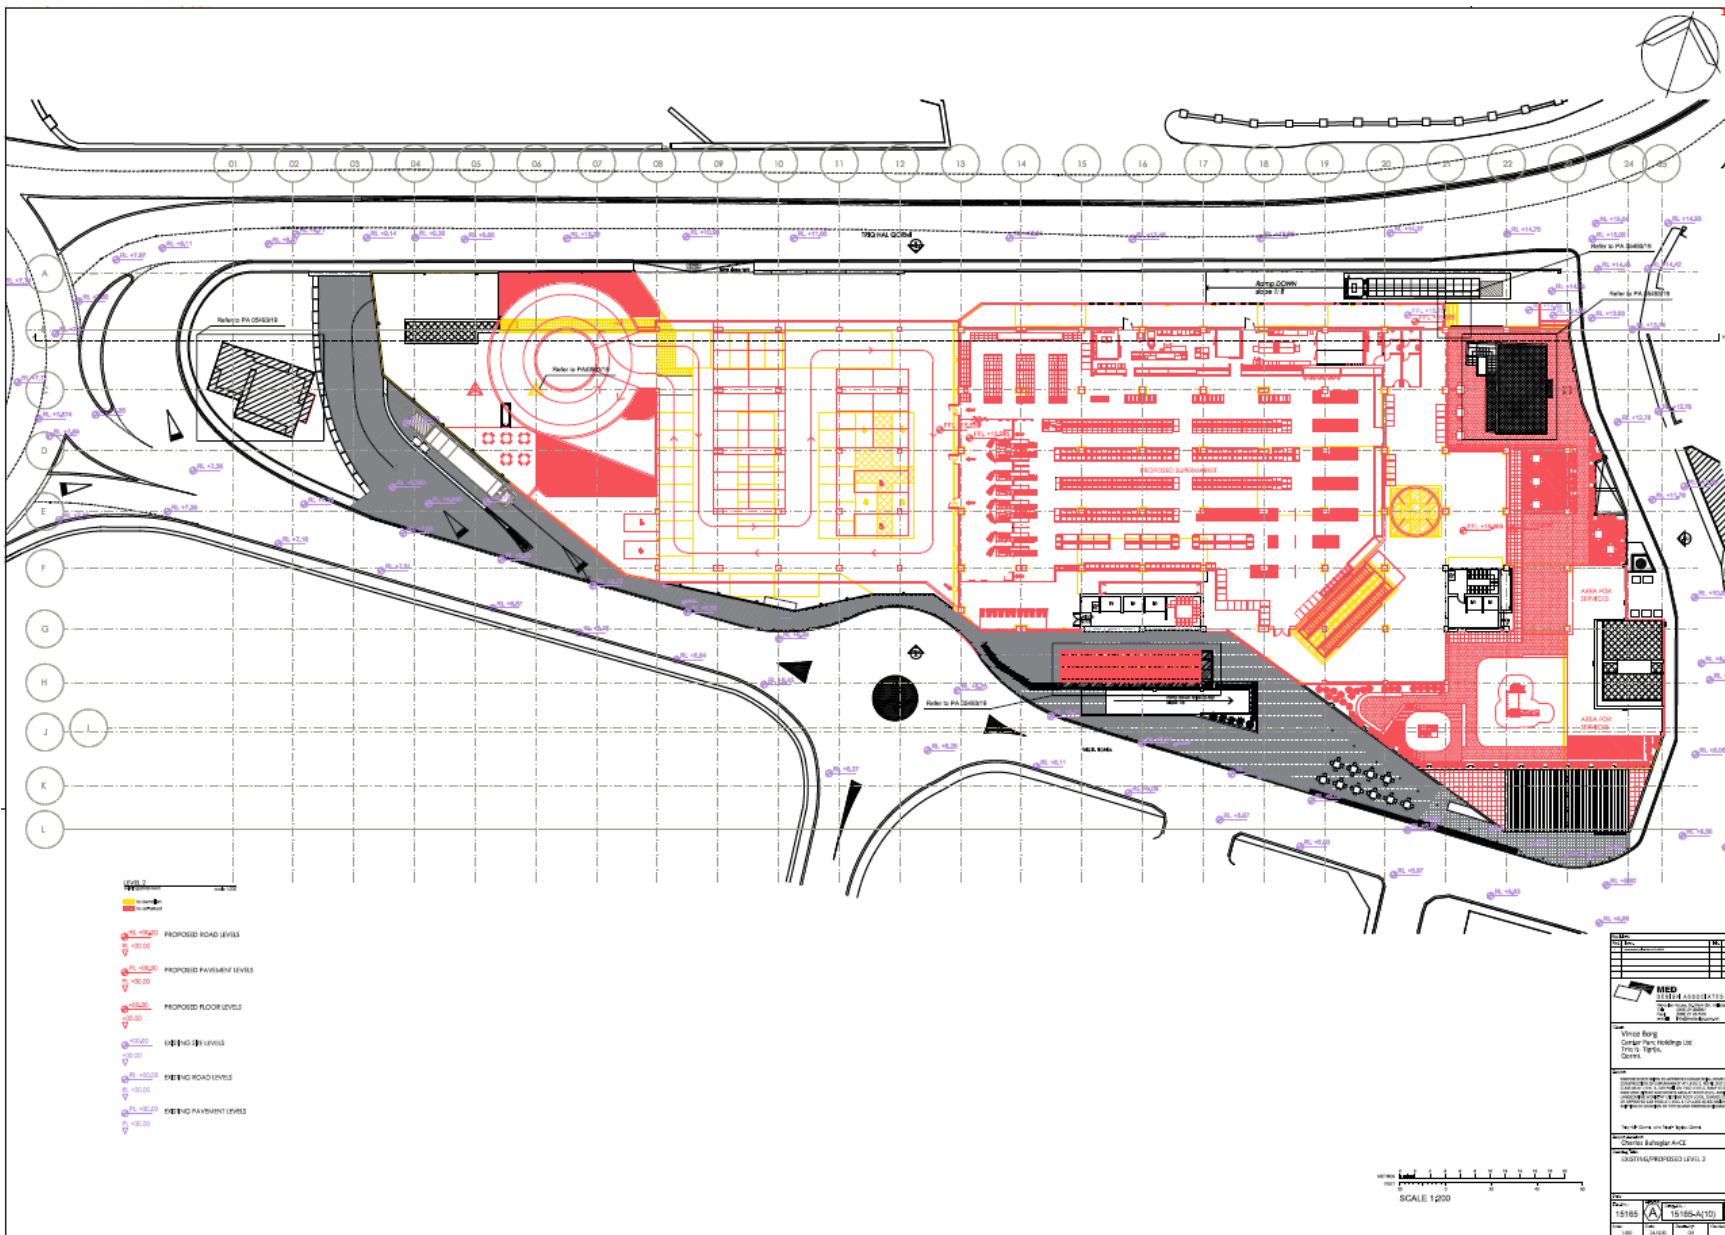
Plan showing the existing and proposed at level 2. Source: E-Apps PA 08866/20/Doc 16k.
